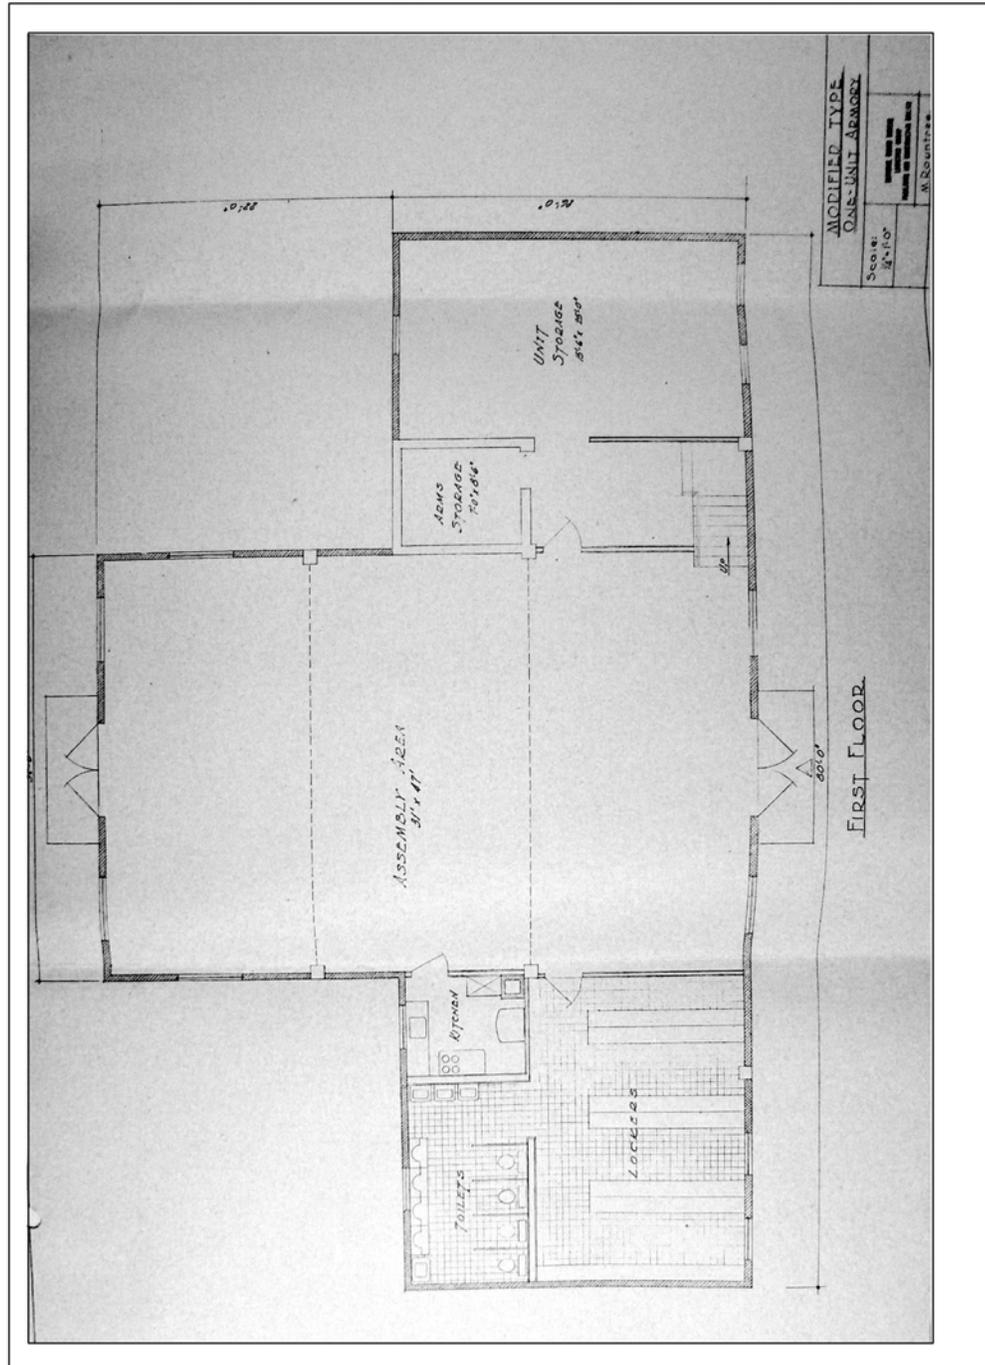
Standard Plan for an Armory developed by the National Guard with the Army Corps of Engineers, 1948 (courtesy of the National Archives II, College Park, MD, Army-National Guard Bureau Decimal File, 1946-1948, RG 68).
